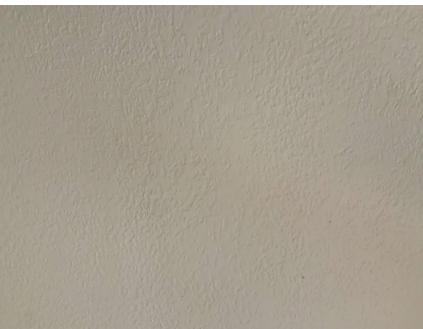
HA-02: White Wallboard with Joint Compound
